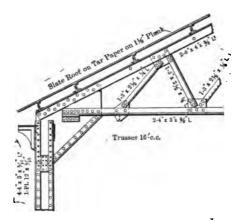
Template Shop Roof-truss, Ambridge Plant of the American Bridge Company.
